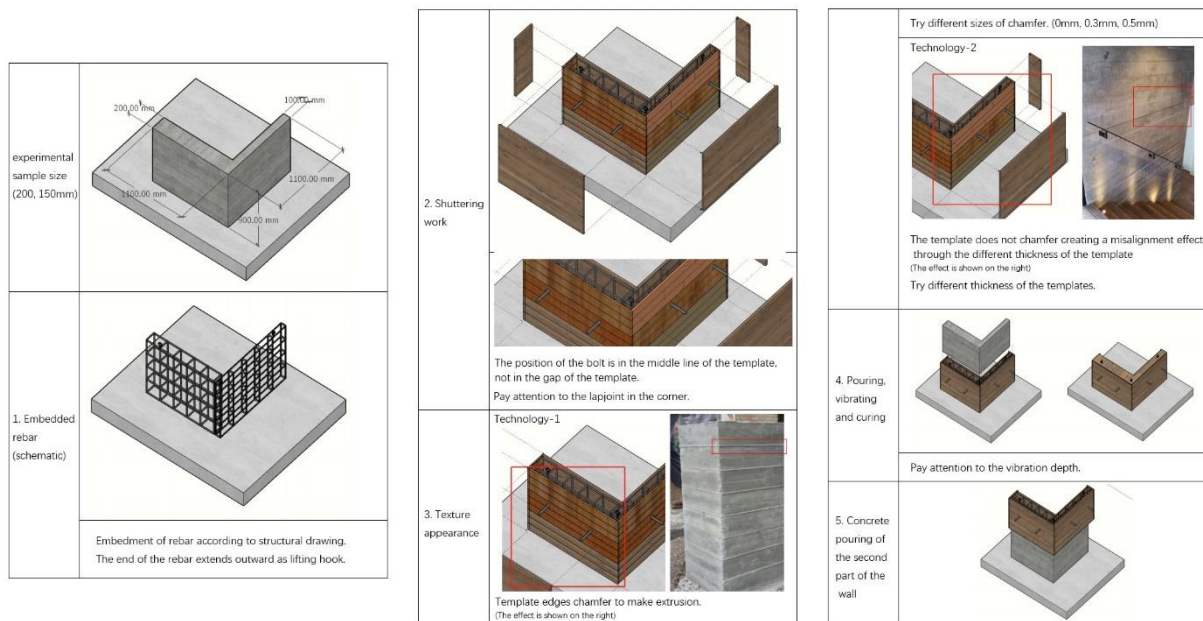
The drawings instructing the wood-grained concrete construction experiment
